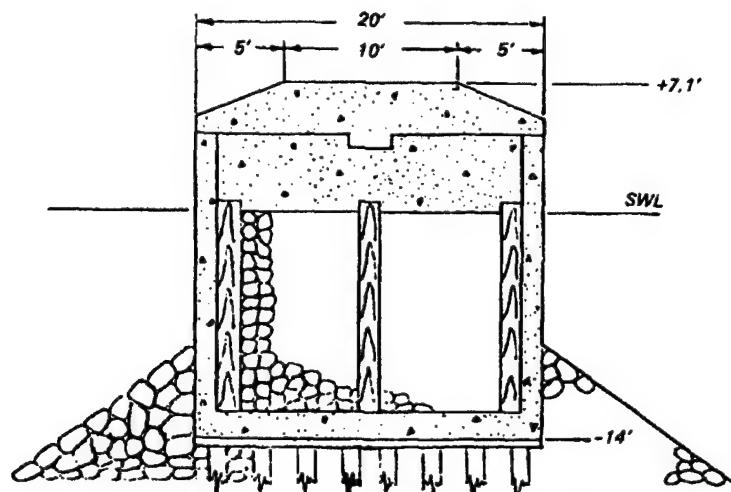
Composite jetty sections constructed at South and Southwest Passes, Mississippi River Outlets
